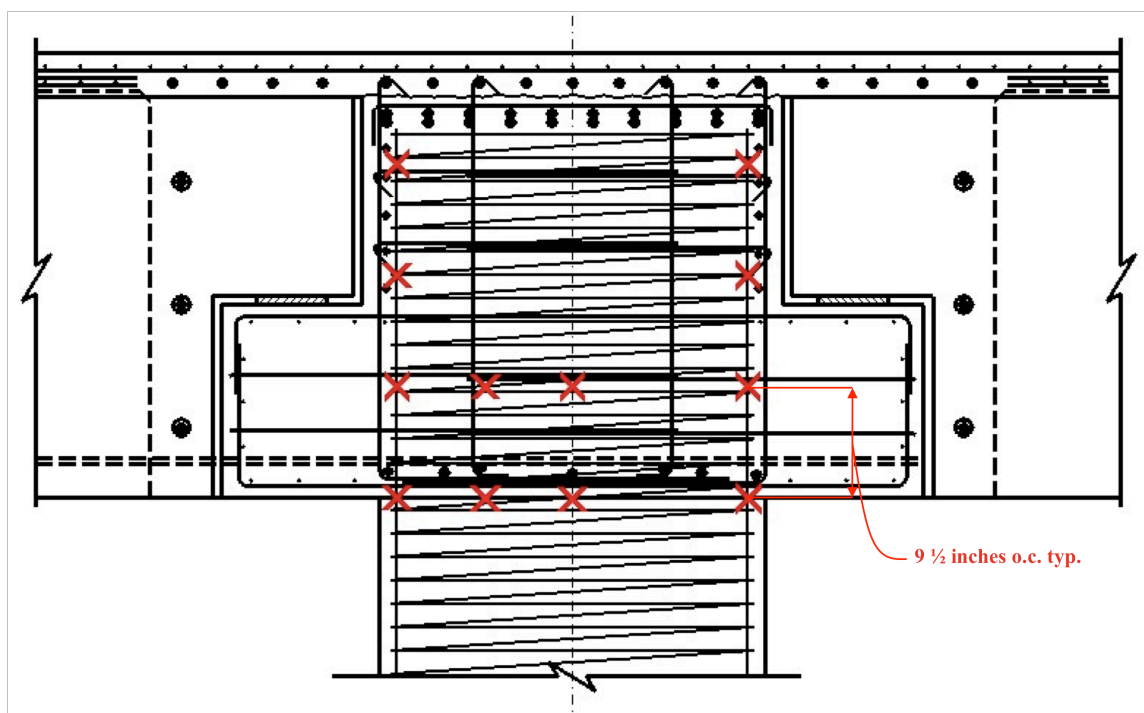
Profile of Gauged Longitudinal Column Reinforcement within the Joint
